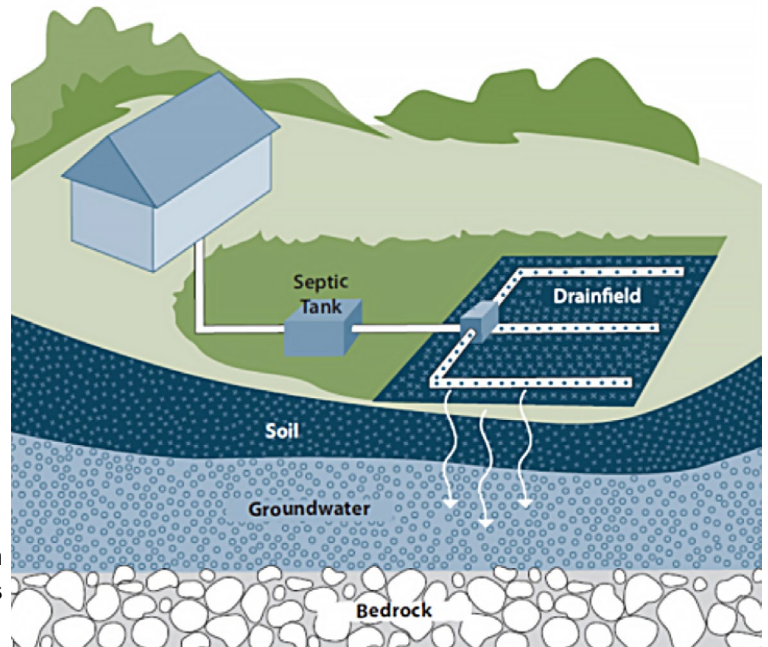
A conventional on-site wastewater dispersal system for a single house is typically made up of a septic tank and a drainfield installed in the soil above the water table. (Reprinted by permission from The Groundwater Foundation. [“Potential Threats to Our Groundwater: On-Site Wastewater Treatment Systems.”](http://www.groundwater.org/get-informed/groundwater/wastewater.html) www.groundwater.org/get-informed/groundwater/wastewater.html.)
